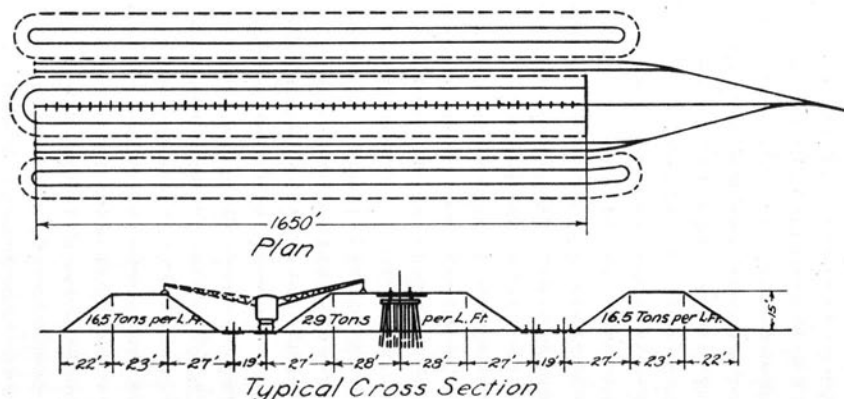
PLAN AND SECTION ILLUSTRATING STANDARD COAL STORAGE SYSTEM OF THE NEW YORK, NEW HAVEN, AND HARTFORD RAILROAD (TONNAGE GIVEN PER LINEAR FOOT)
